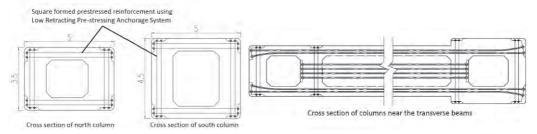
Layout of prestressed reinforcement in columns and transverse beams
